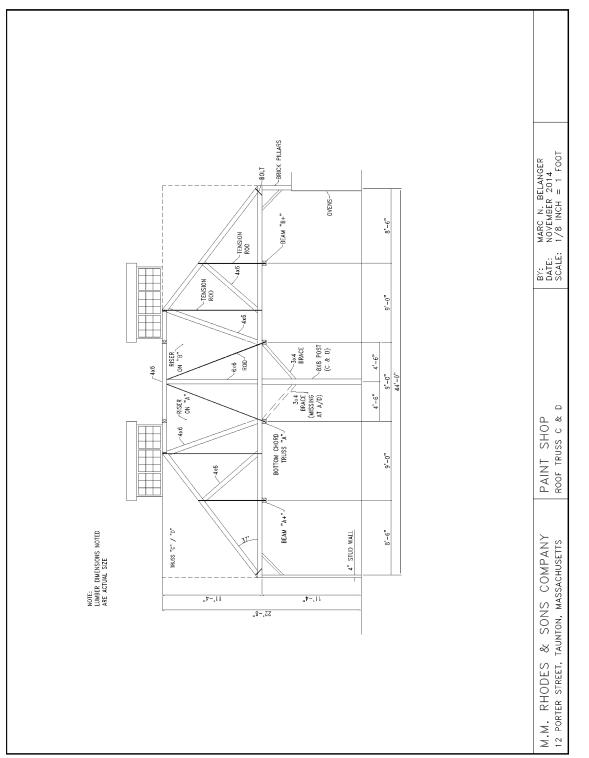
Measured Drawing. Paint Shop Roof Framing, Truss C & D.
